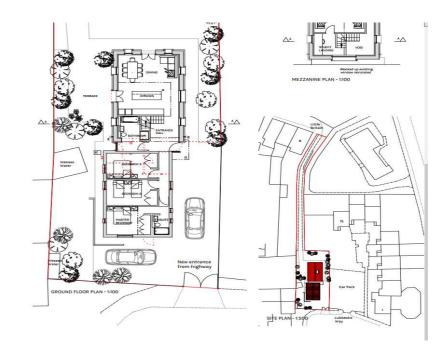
Two parking spaces accessed from Lubbecke Way.
